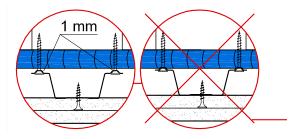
Method of resilient ceiling connection via flexible hanging steel profile
